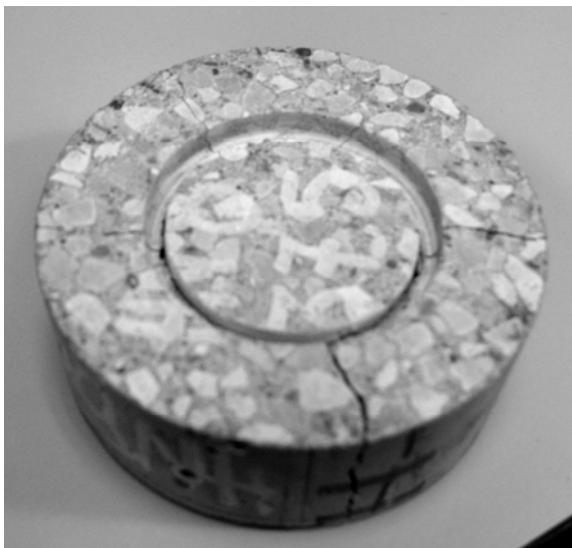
Radial cracks in a conventional concrete specimen tested under confining pressure of 2 MPa.
